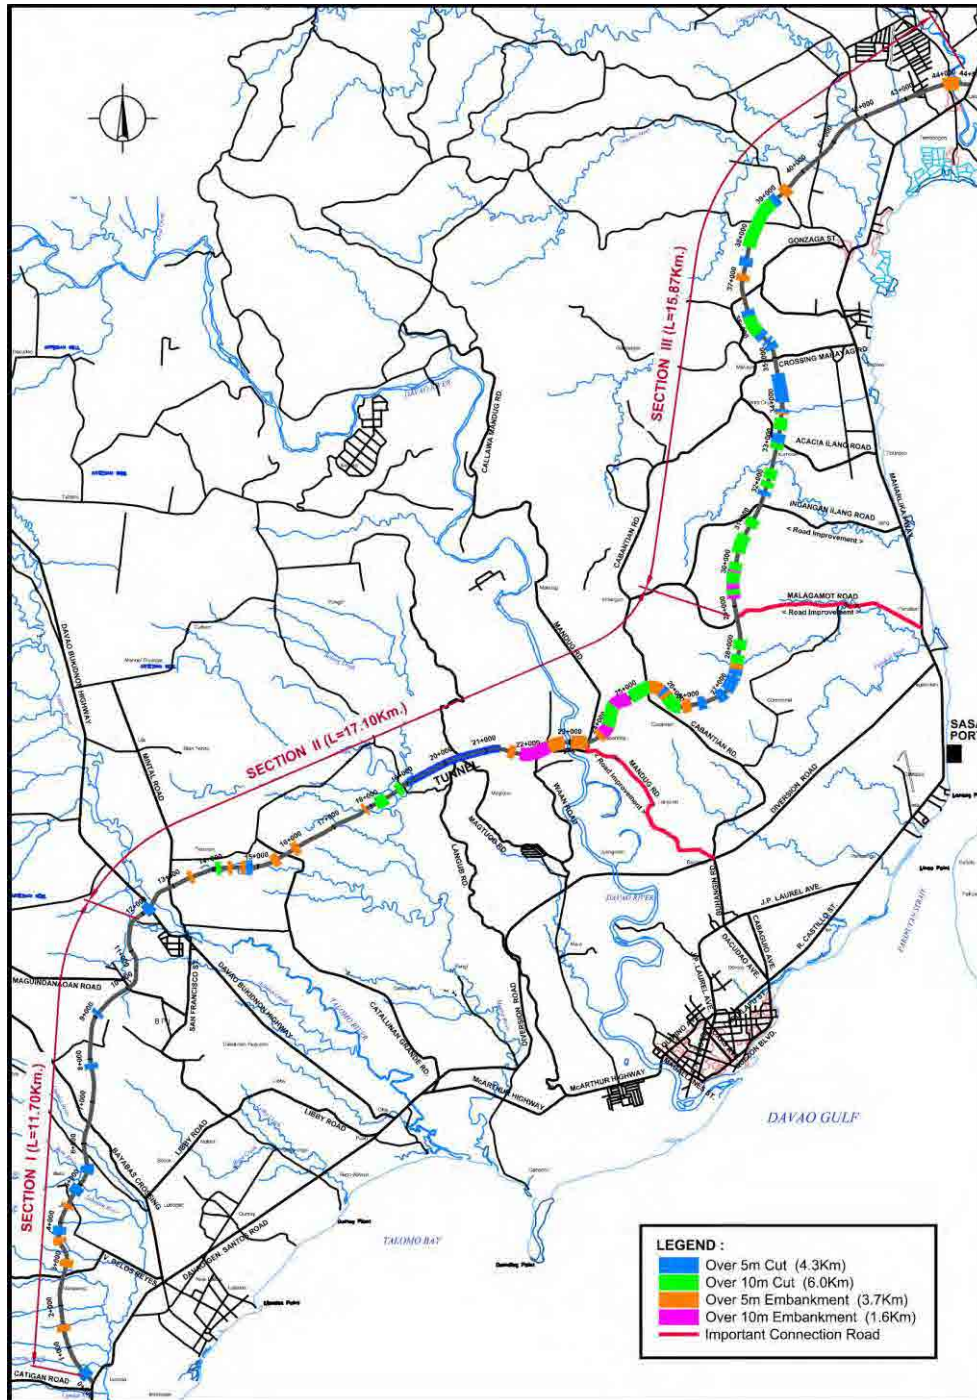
LOCATION MAP OF HIGH CUT AND EMBANKMENT SECTION CROSSING SECTION
